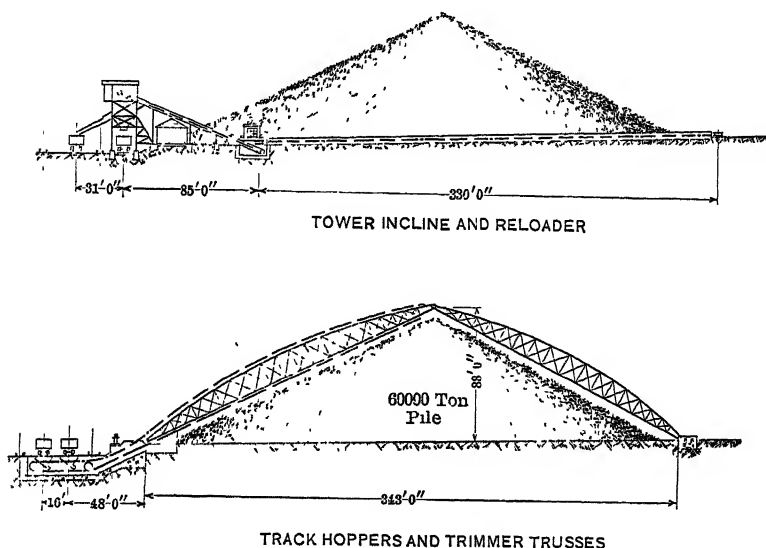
STANDARD TYPE OF DODGE STORAGE-PLANT.
